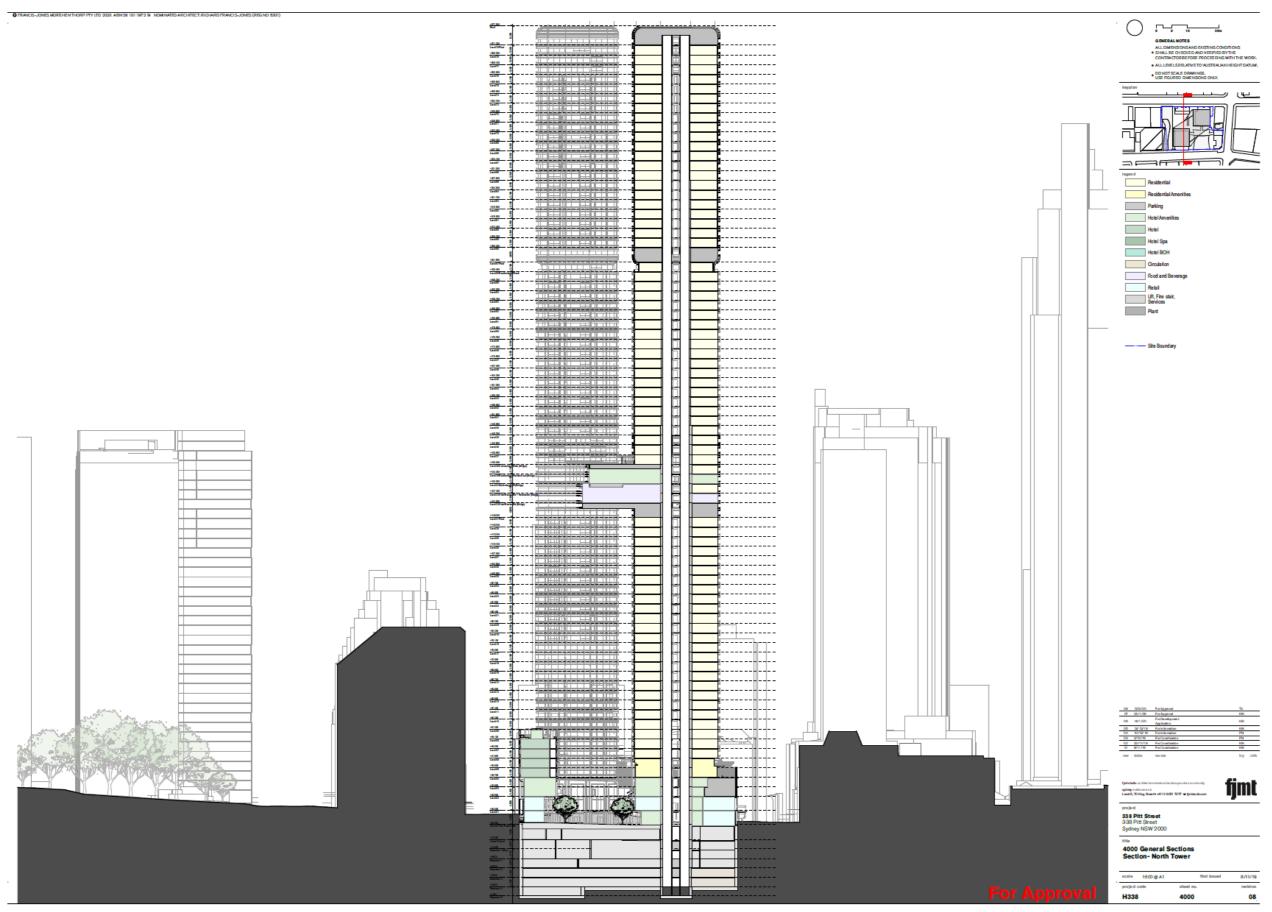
Indicative section plan showing layout of buildings and basement levels.
